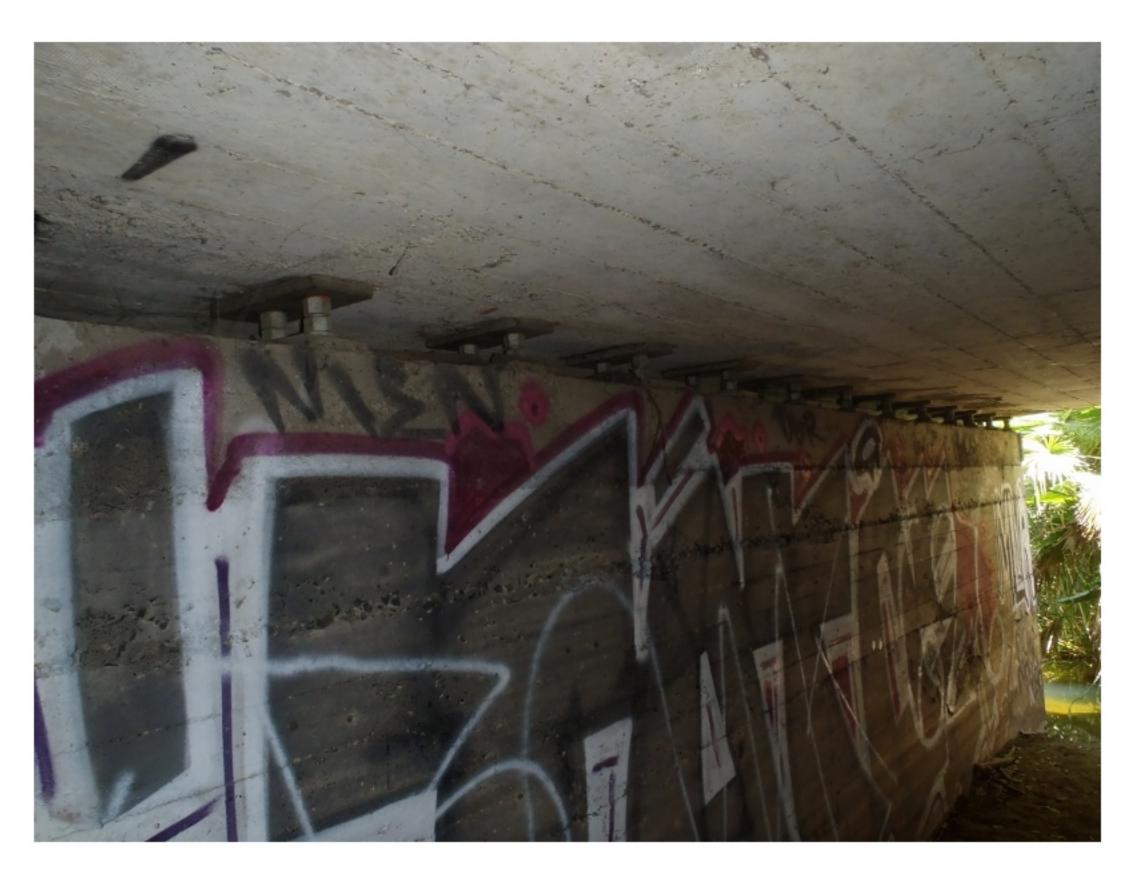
UNDER VIEW TOWARD THE MIDDLE PIER WALL
